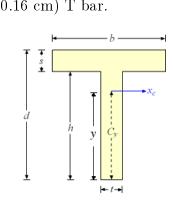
Dimensions of a T bar used in the structural calculations. Source:< http://www.efunda.com/designstandards/beams/SquareTbeam.cfm>
